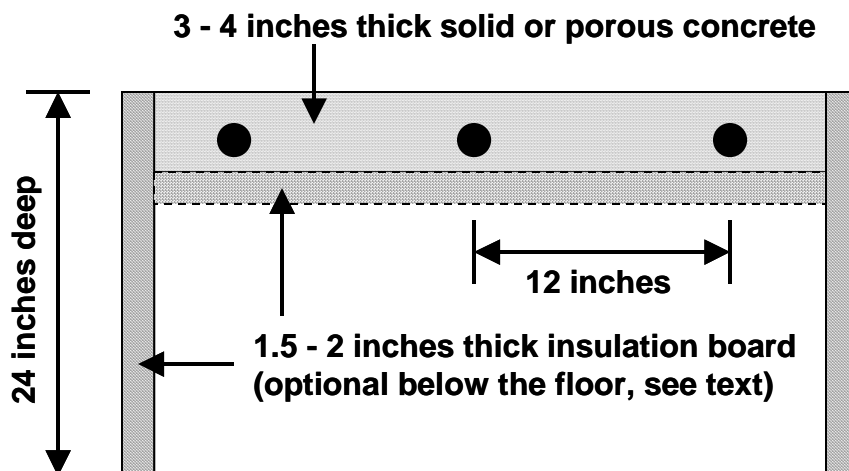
Sketch of a dry floor heating system and its components (not to scale). Heating pipe spacing is commonly 12 inches when using 0.75 inch diameter pipe, and 9 inches when using 0.5 inch diameter pipe.
